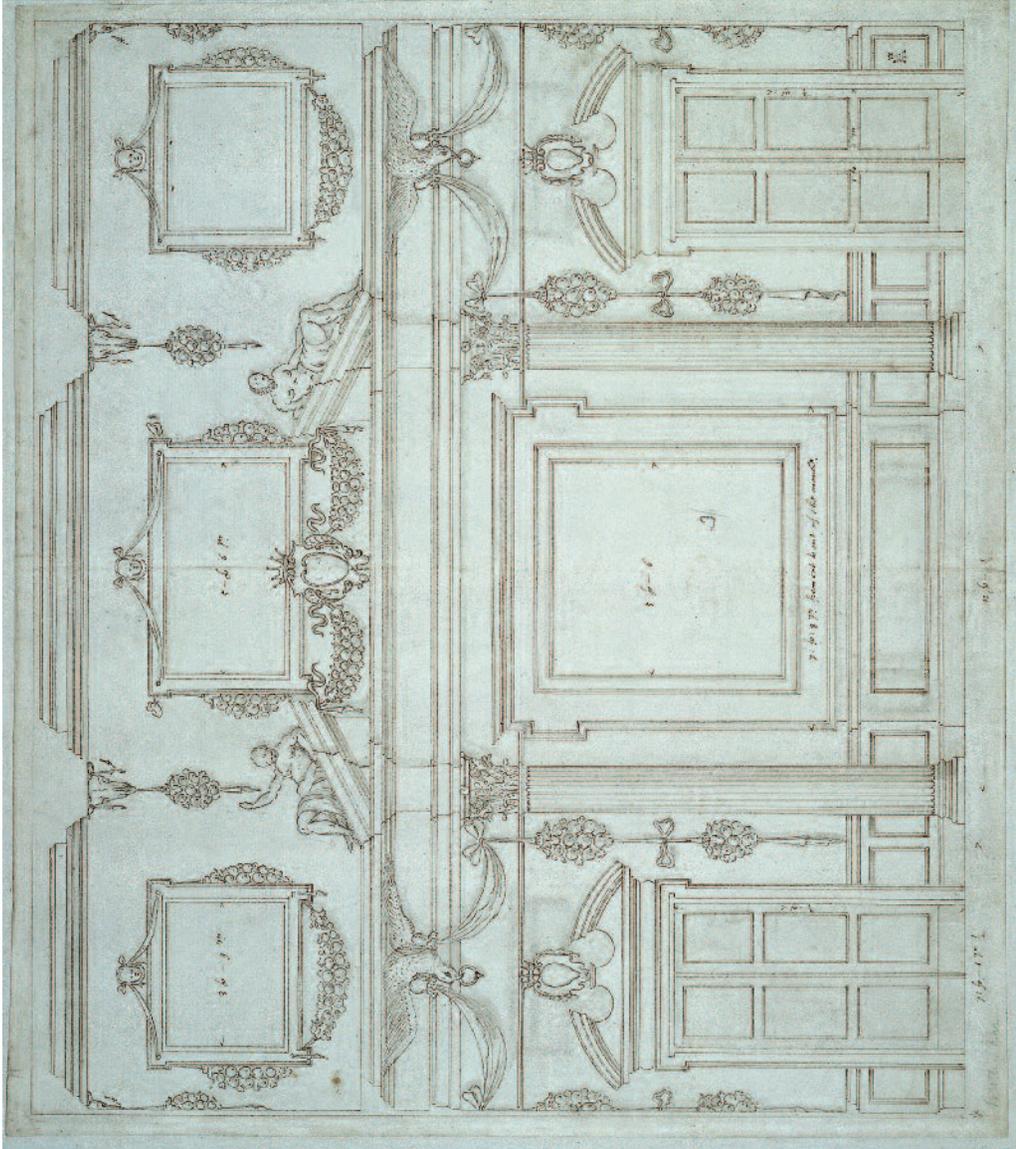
John Webb, proposed elevation of west wall of Great Room at Chevening.
